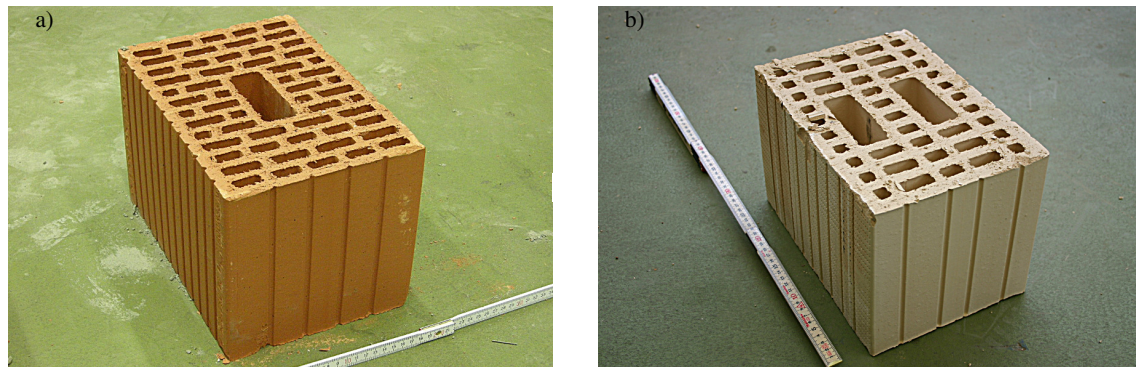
Hollow clay bricks used for the construction of the composite spandrels: Brick type 1 (a) was used for TU1, brick type 2 (b) for TU2-5.
